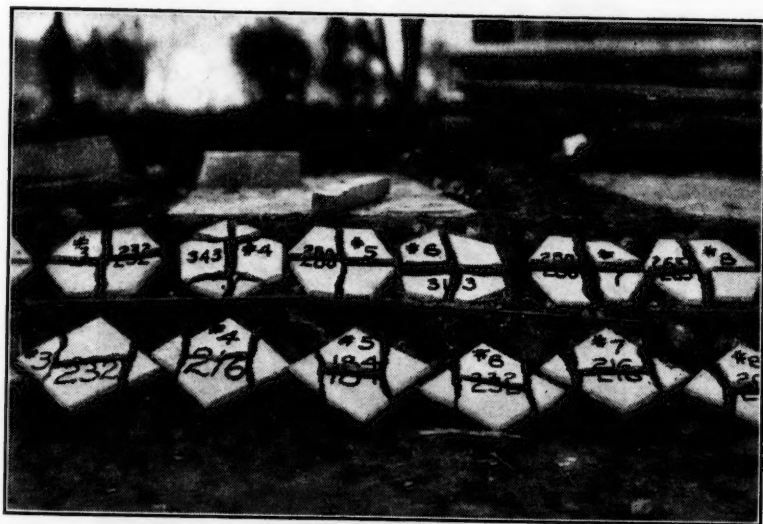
GROUP OF TEST SPECIMENS AFTER SECONDARY LOADING. HEXAGON SPECIMENS BROKEN INTO PIECES OF UNIFORM SHAPE AND SIZE.
